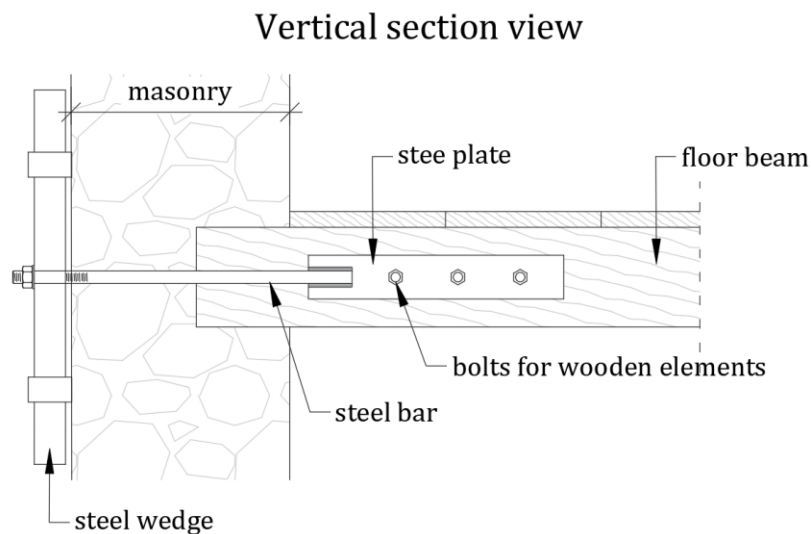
Example of a steel post connector between the floor beams and the masonry
